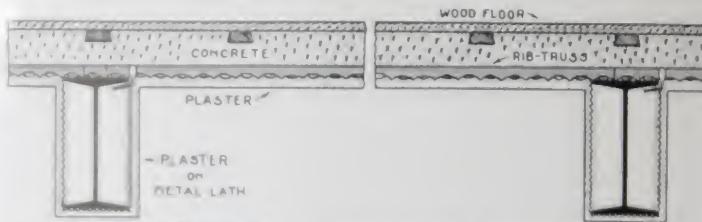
Flat Arch Floor Construction with Suspended Ceiling
